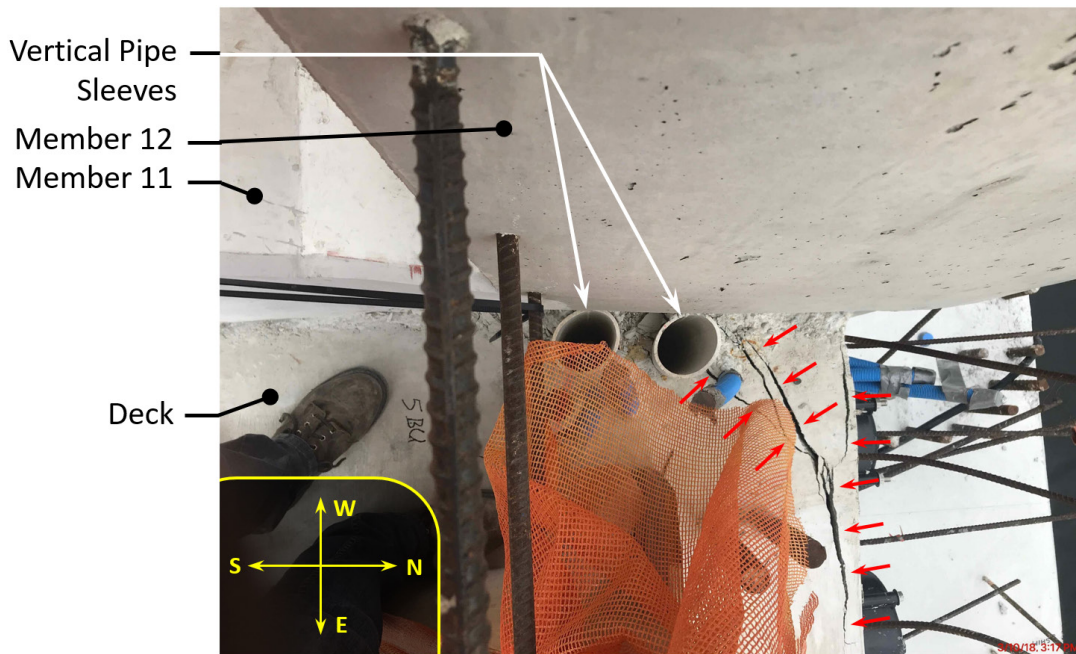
Photograph looking vertically downward along east side of truss member 12 after the truss member 11 post-tensioning rod detensioning operation. Captured on March 10, 2018 at 3:17 p.m. Corresponds to Bridge Factors Factual Report Photo 65.
